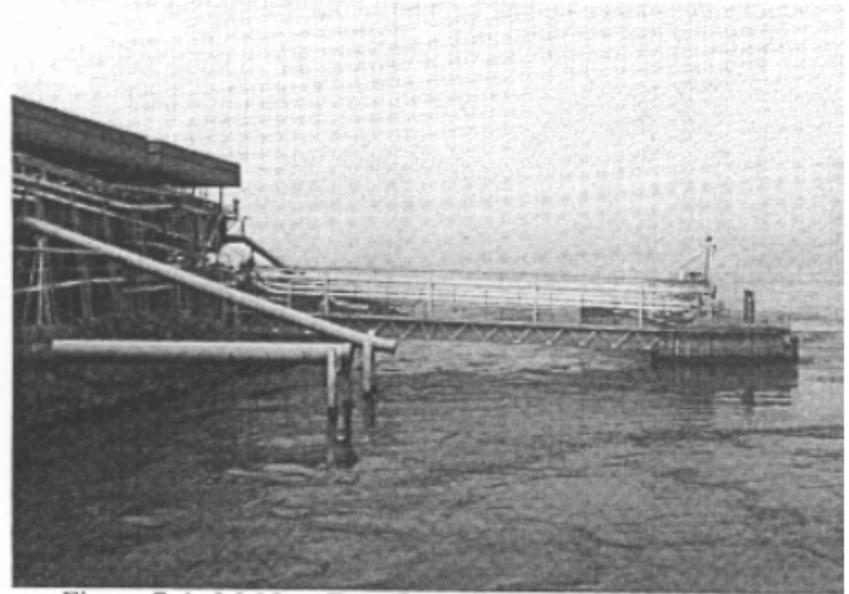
McNary Dam Juvenile Bypass System Drains
